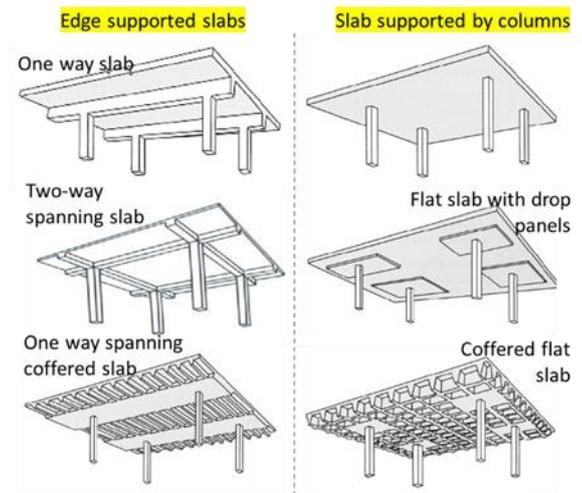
Type of slabs under variety conditions; edge supported slabs and slabs supported by columns
